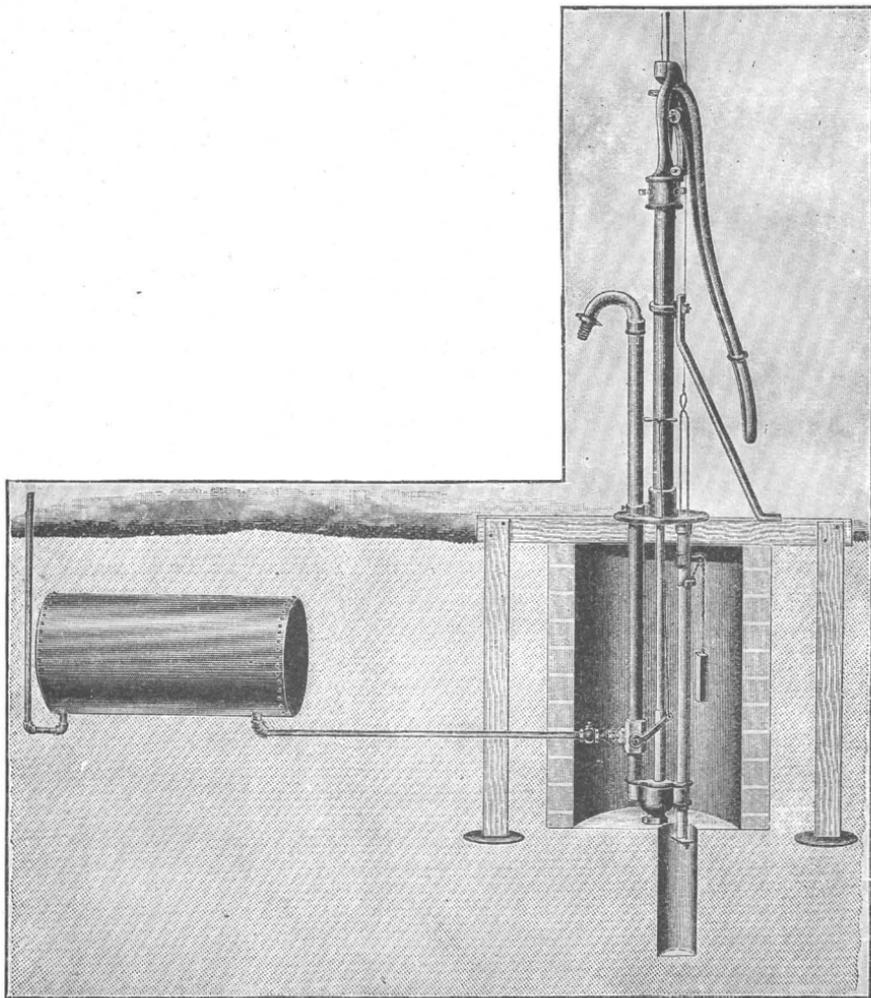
Pump, pressure tank, and hydraulic regulator of mill No. 37—12-foot Woodmanse Mogul.
